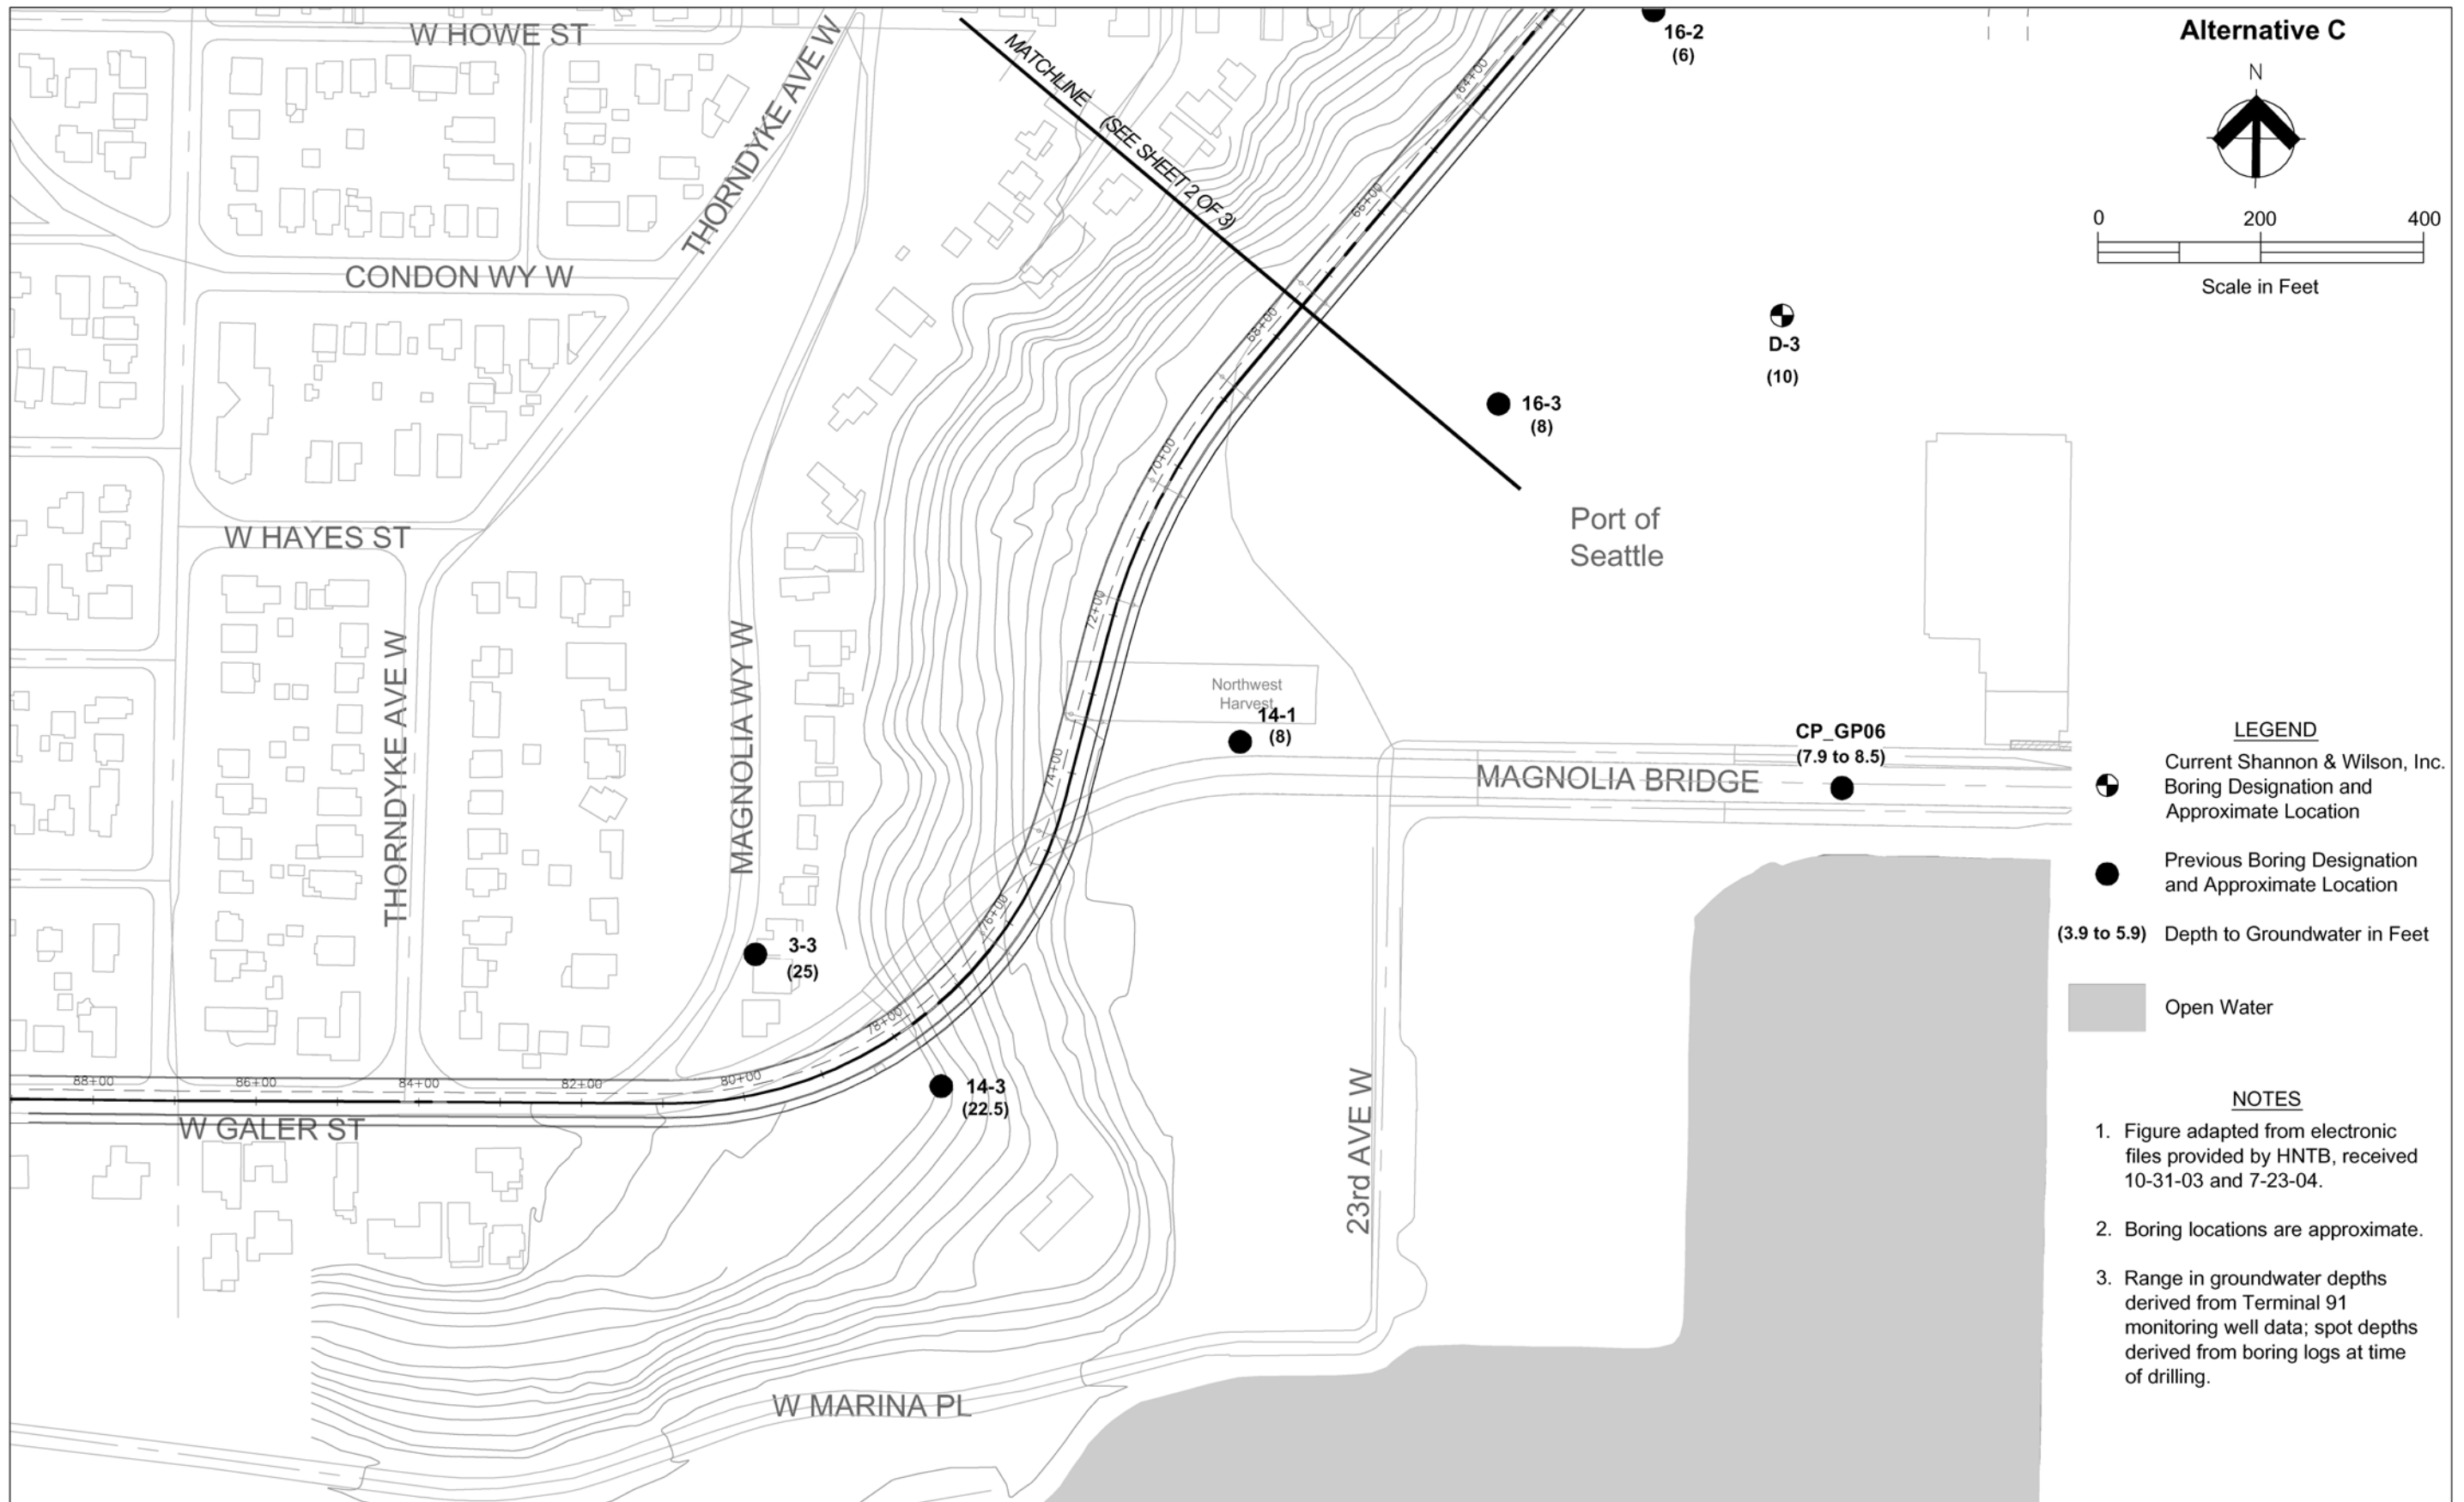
, Sheet 1 of 3 - Depth to Shallow Groundwater - Alternative C
